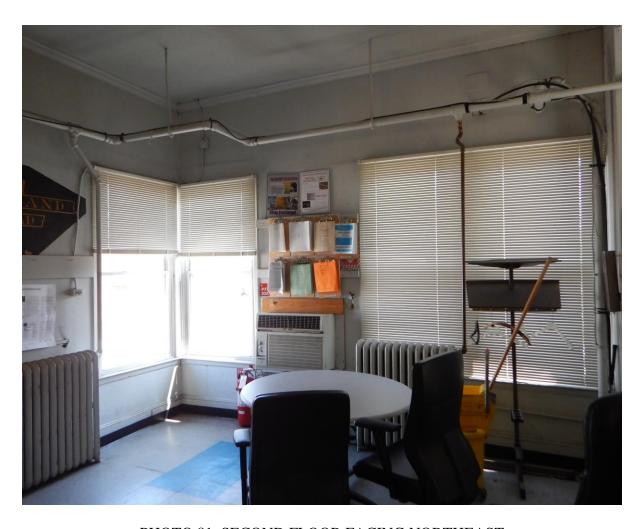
SECOND FLOOR FACING NORTHEAST
